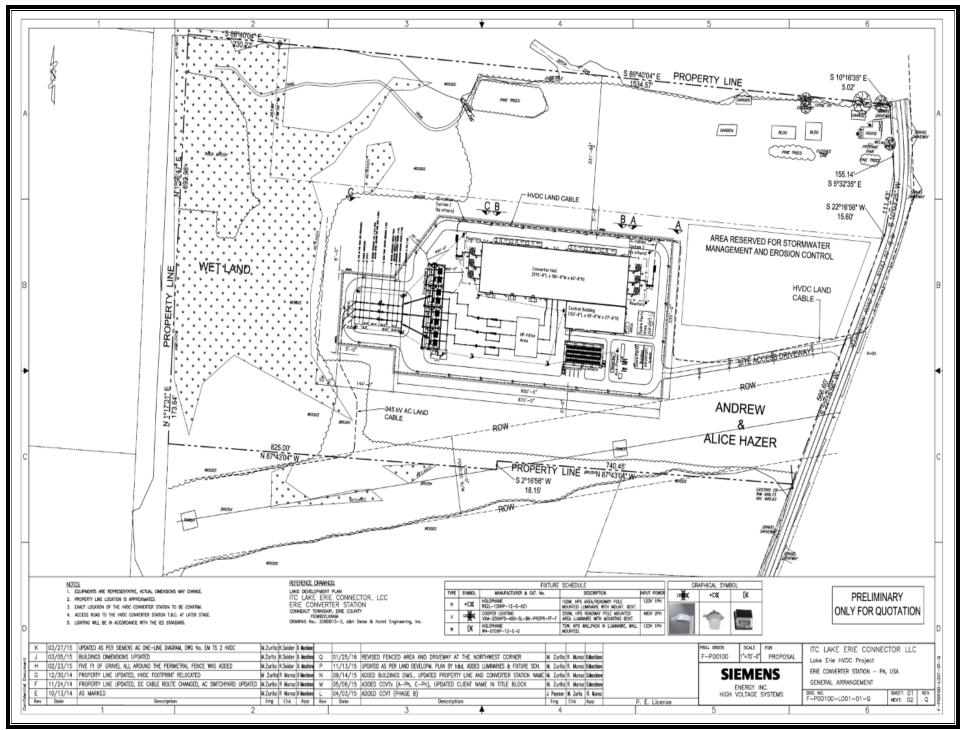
PRELIMINARY ERIE CONVERTER STATION SITE LOCATION AND LAYOUT
